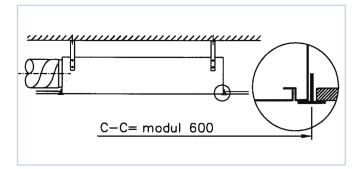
Installation in ceiling, designed to fit T-profile ceiling system.
